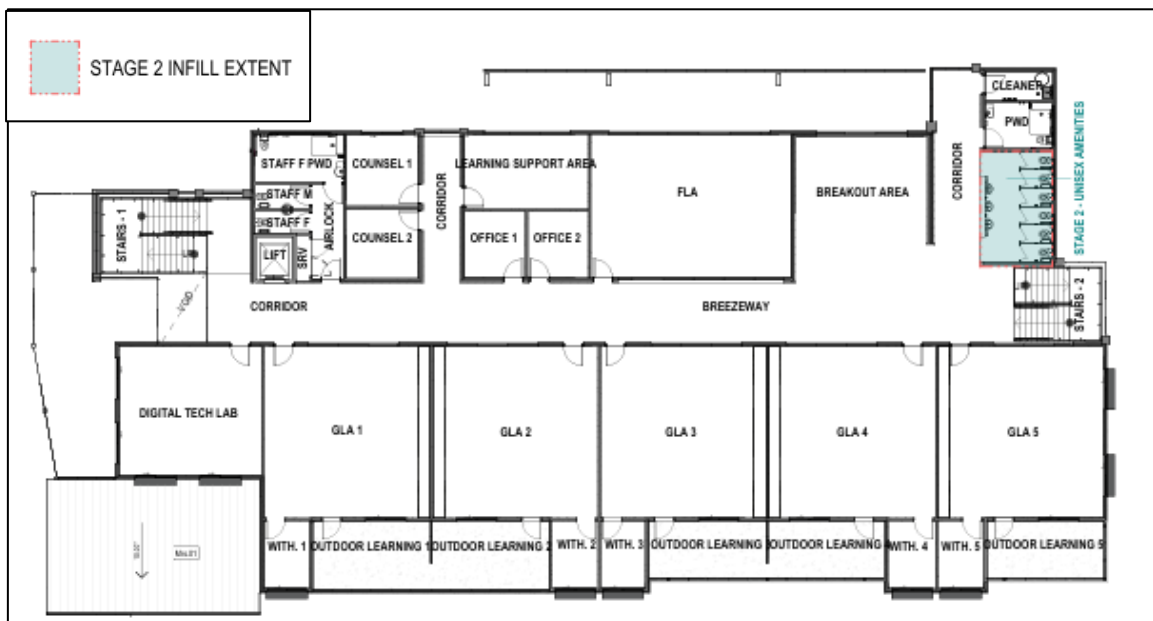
Upper-level plan showing extent of the building to be delivered in Stage 2
